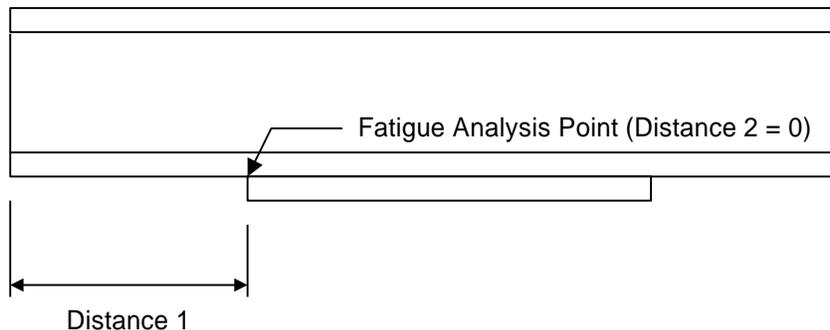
Fillet Weld at Bottom Cover Plate
